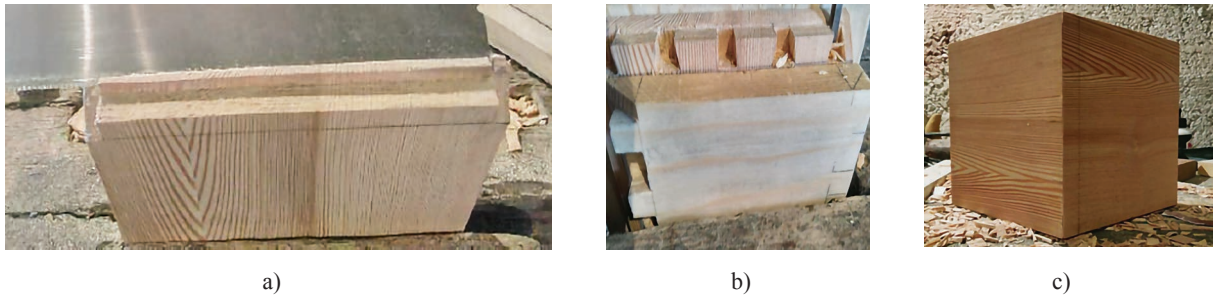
Crafting a full-blind dovetail: a) marking out, b) crafting c) final joint
